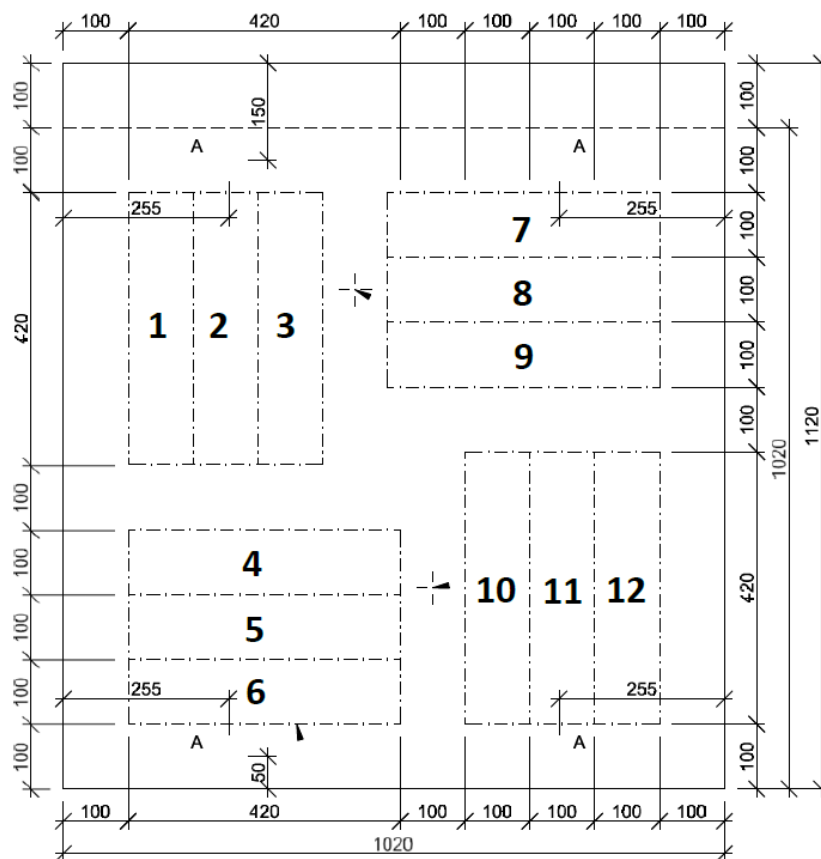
Sketch showing how beams are to be cut from the test slab. Filling is from the top.
